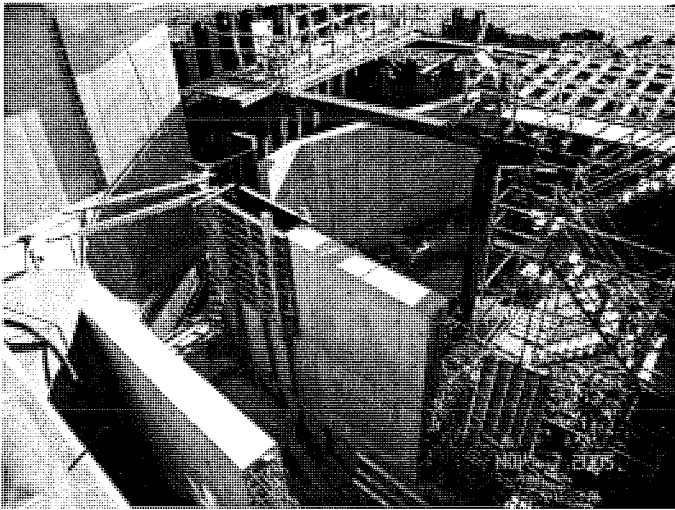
Picture taken October 5<sup>th</sup> 2005 from Burnham Dam facing down stream overlooking fishway structure. Fishlift entrance gate is visible in top center of picture. Hopper will be located in bottom center of picture. The large pipe in right side of picture is the down stream passage and will aide in attraction
